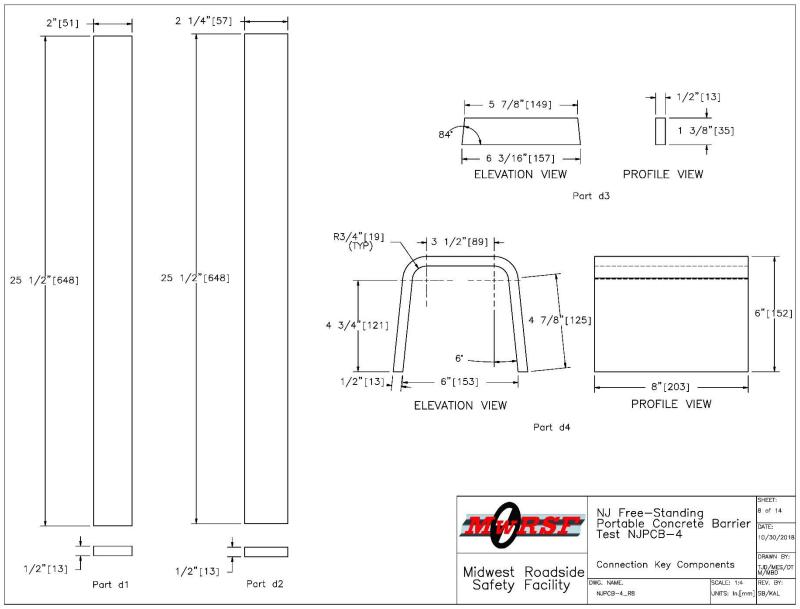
Connection Key Component Details, Test No. NJPCB-4
